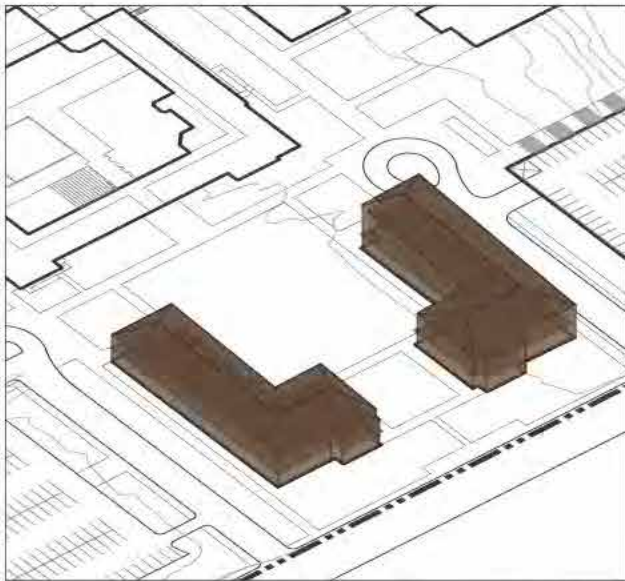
Axonometric and Site Plan of new Student Services and Administration buildings
